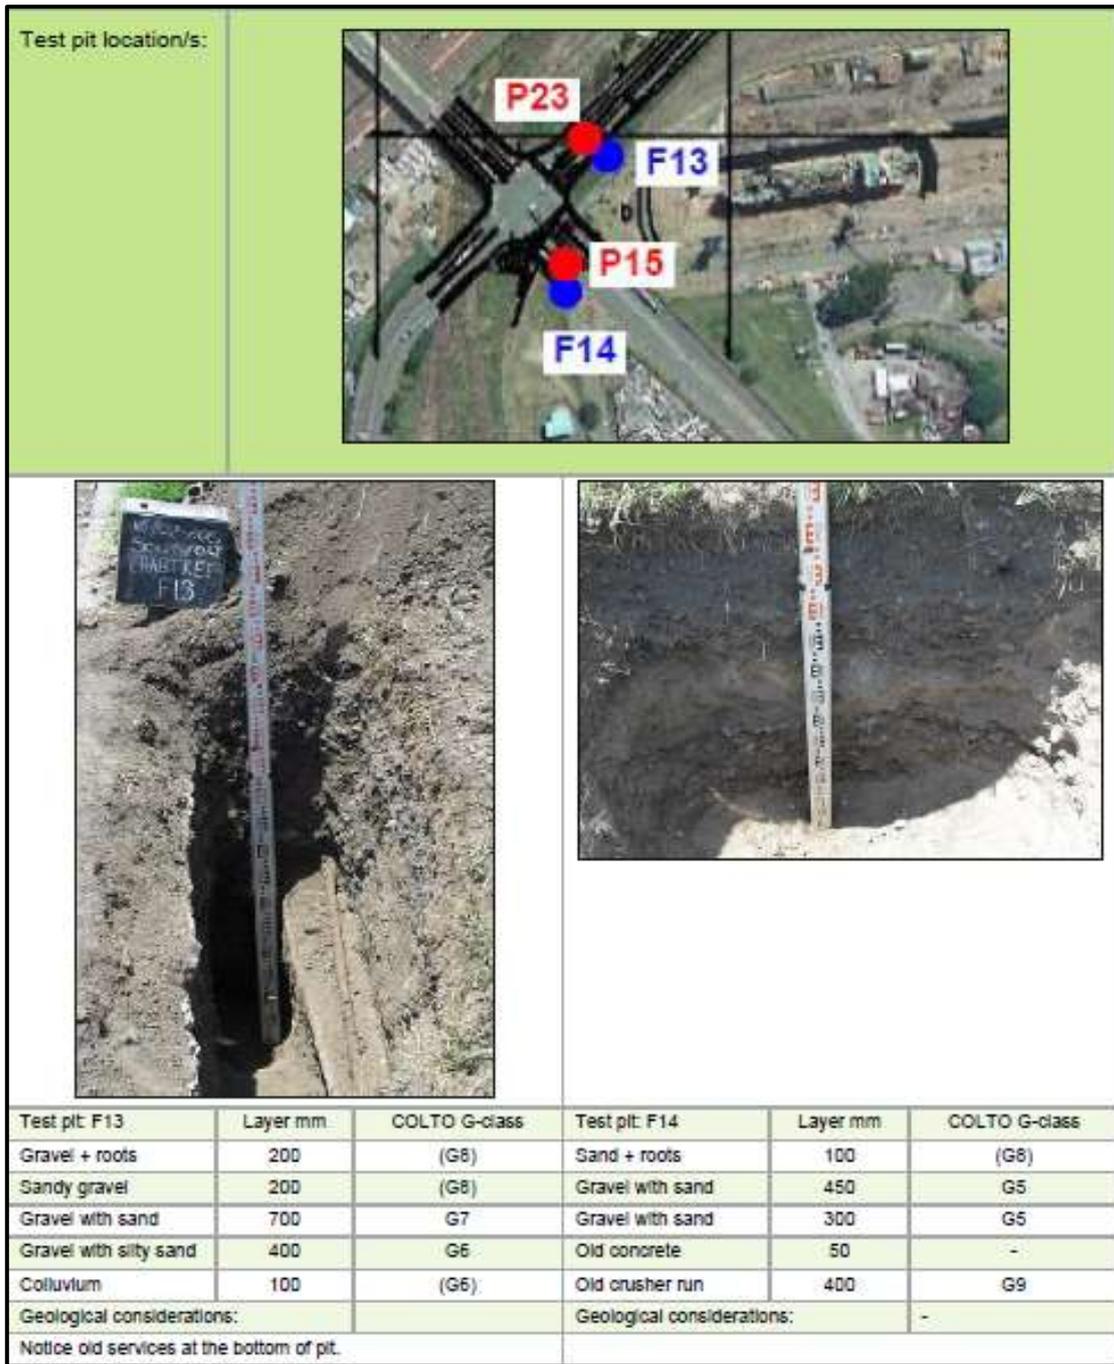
Bayhead/South Coast Road Intersection Test Pit Locations (2)
